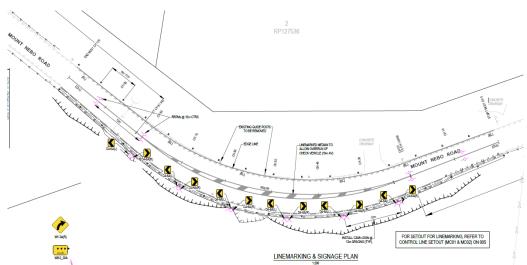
Plan section of the works, 1044 Mount Nebo Road Curve Upgrade
